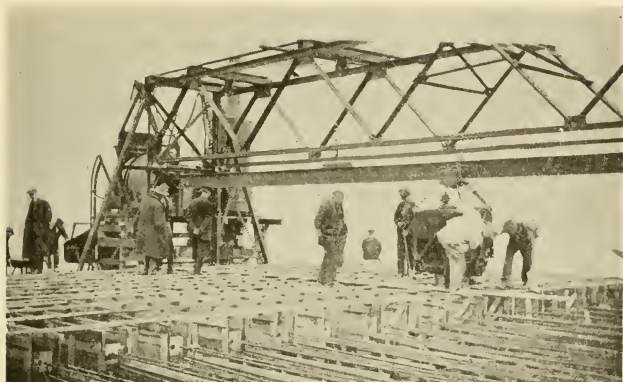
CASTING YARD FOR CONCRETE PILES.
